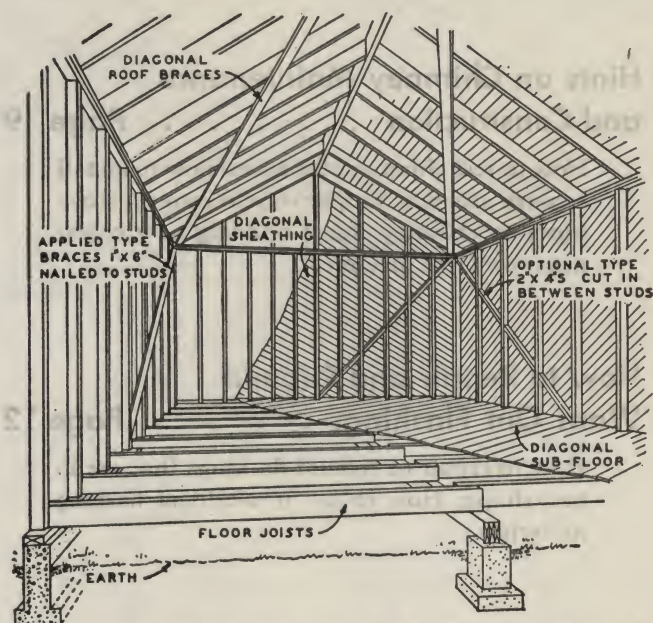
Diagonal bracing at the corners to strengthen buildings of frame construction.
